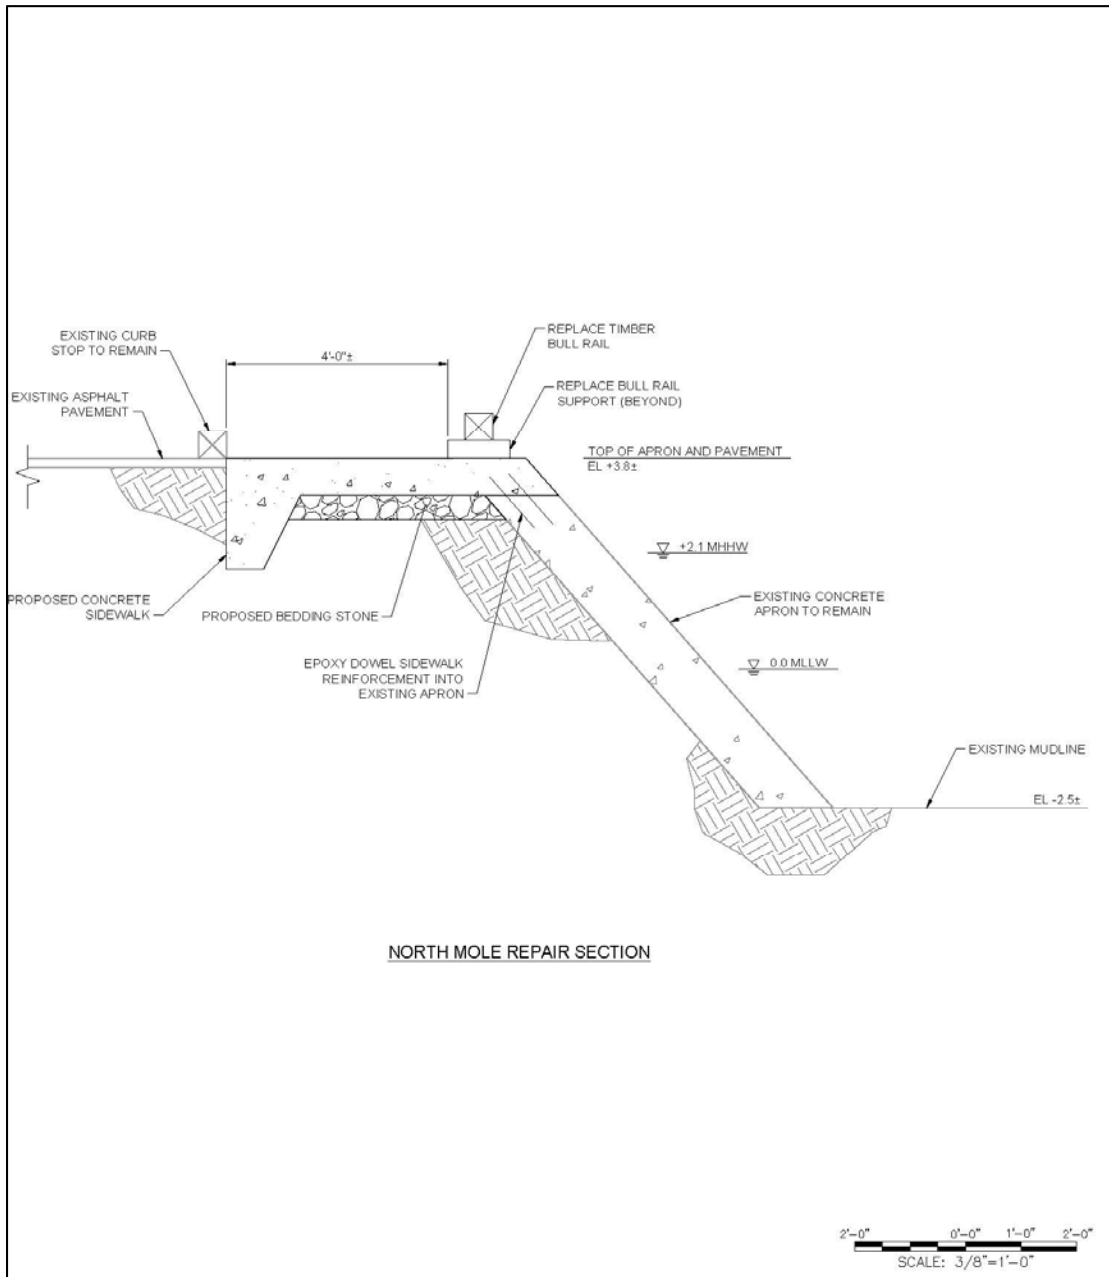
North Mole Repair Sections (Revised 27 April 2018)
